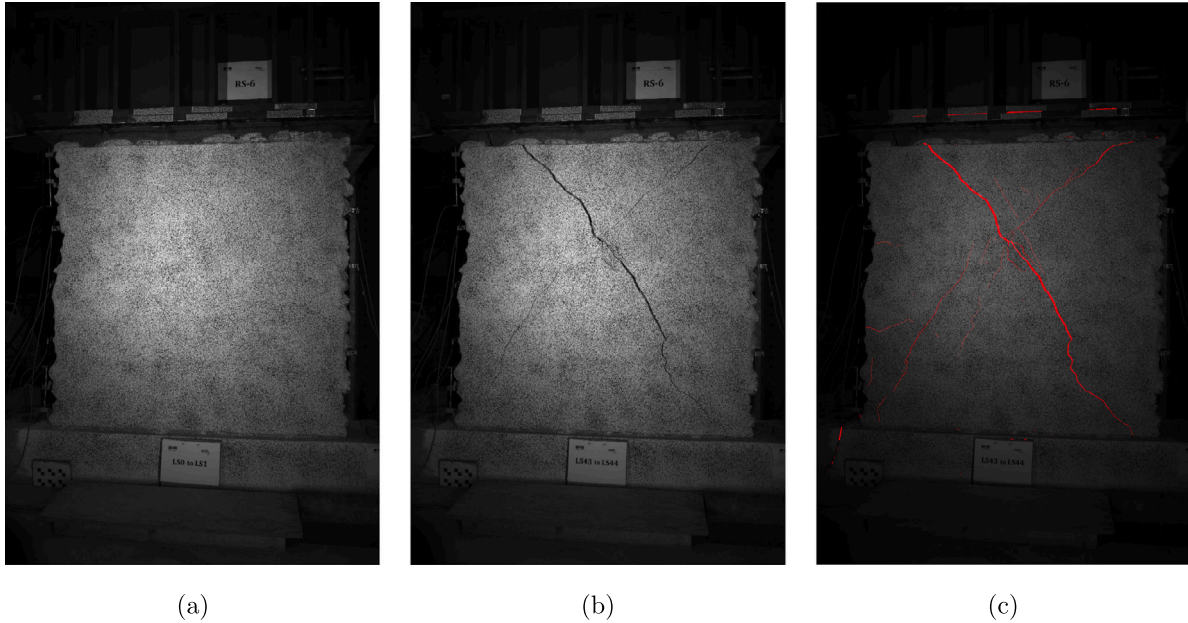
Damaged stone masonry wall used to predict crack kinematics: (a) wall without damage (time instant t_0), (b) wall with damage after applying the load (time instant t_1) and (c) segmented crack overlaid over damaged wall image using deep learning segmentation.
